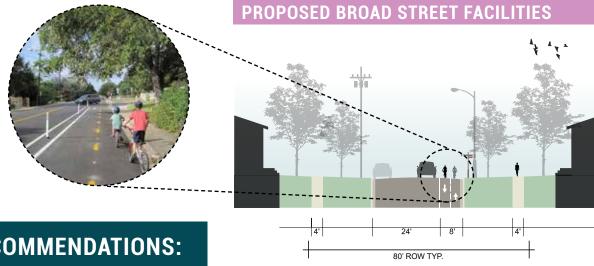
Proposed Two-Way Cycle Track on south side of Broad Street (revised 8/22/2022)
